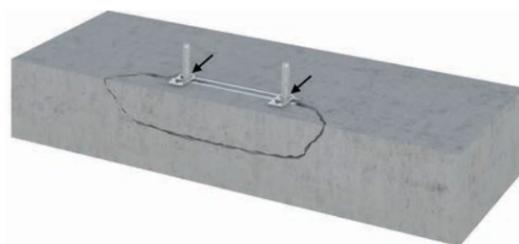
Concrete edge failure due to an anchor channel loaded in shear. Spacing of anchors equal to 5 times the edge distance
